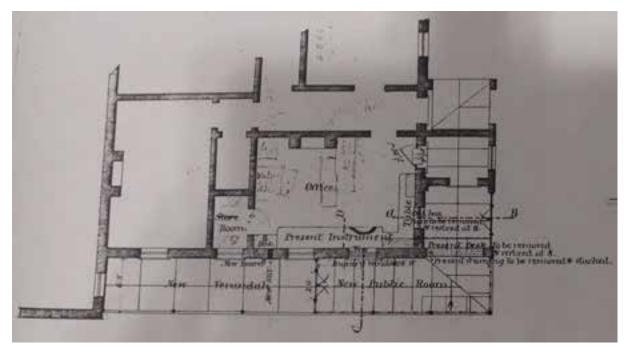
Plan dating to 1887 that showed a new verandah was proposed, along with a 'New Public Room' under the same roofline, along the Tyers Street facade (Saleta 2016).
